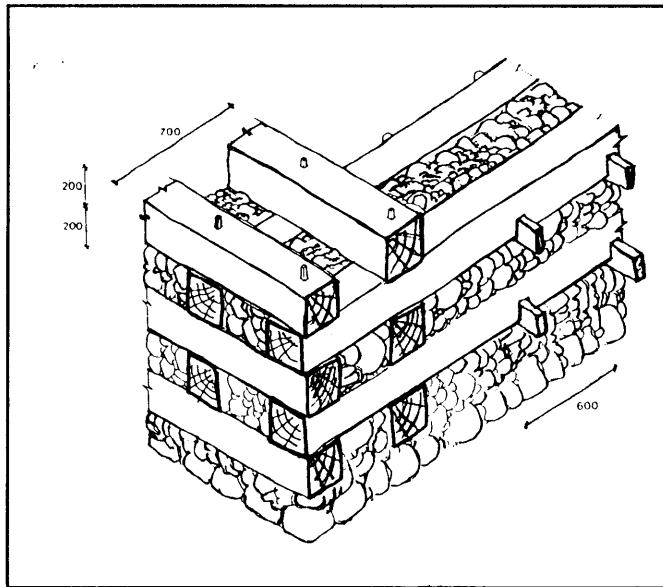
Traditional wall construction with transverse timber ties through the width of the wall.
